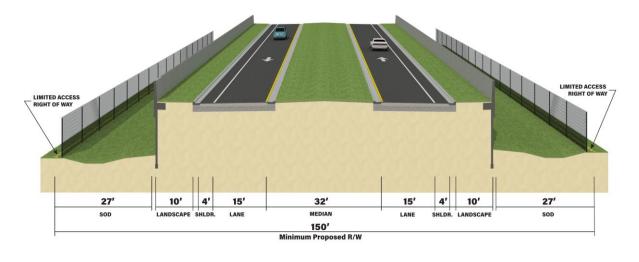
Proposed Connector Typical Section (2-Lane)
